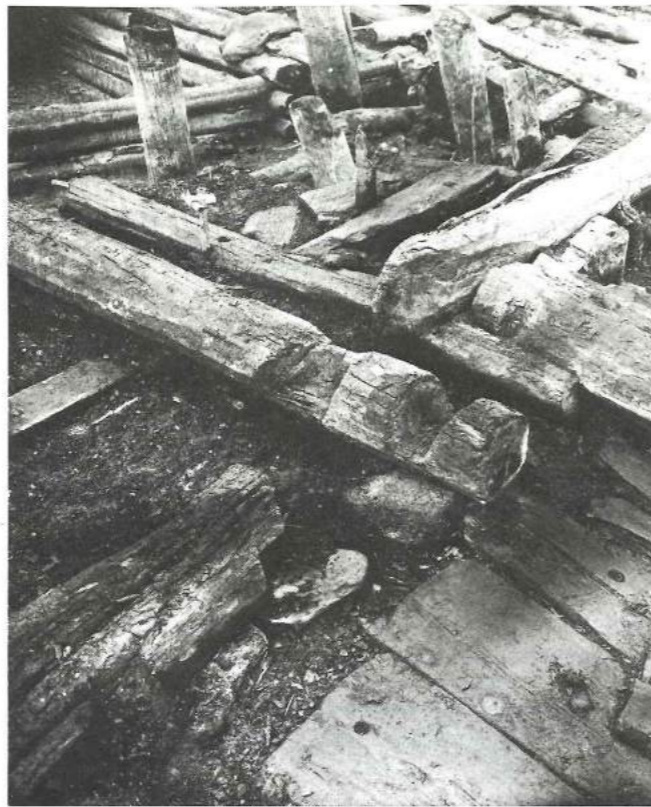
North-east corner of Building 221 with the original lapped corner beyond. A new north wall has been erected in timber-framing. Seen from the north-east.
